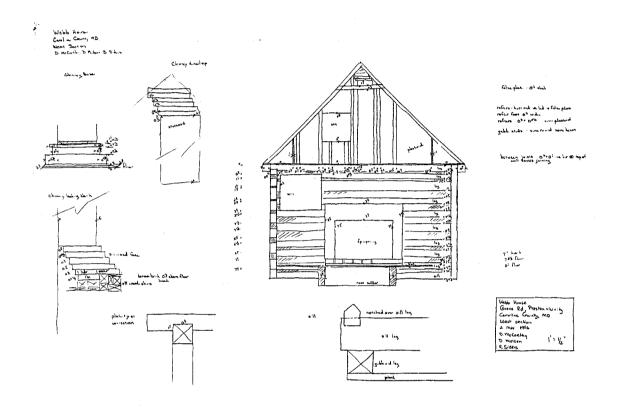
Webb House, field notes for framing section of west fireplace wall.
